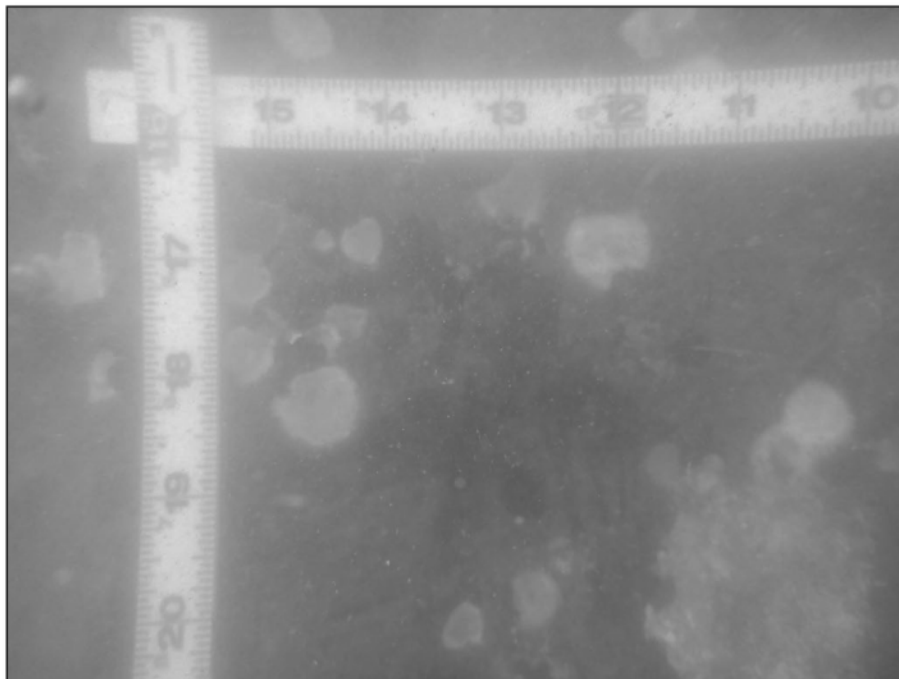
Typical Underwater Condition of 1987 Timber Sheeting
